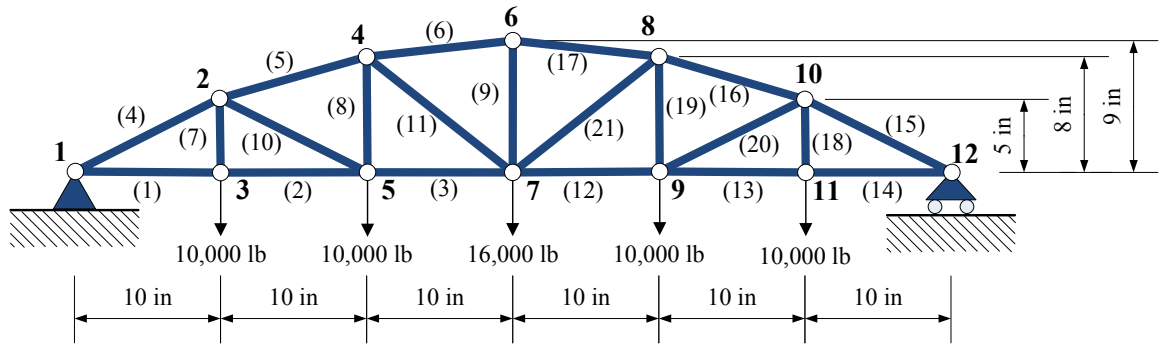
A six-bay, twenty-one-bar truss structure (Example 3)
